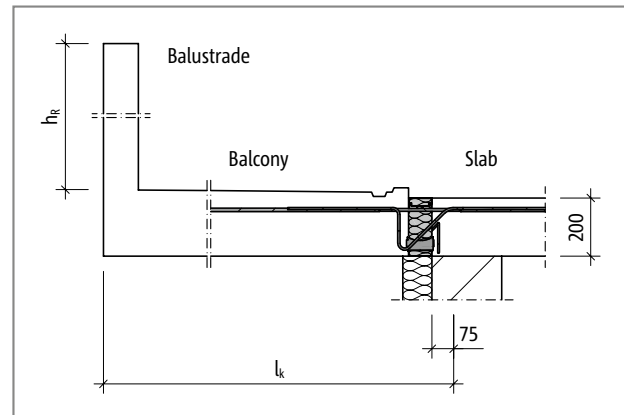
Schöck Isokorb® T type K-E, K-T: Static system, cross-section
